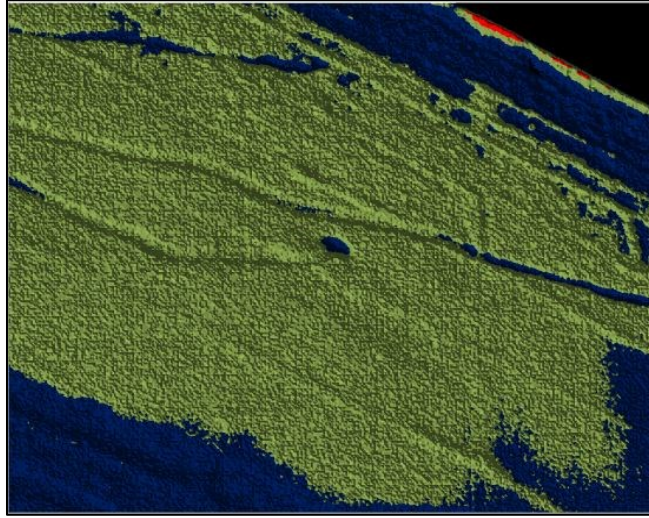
Photo at Location 14 (North Side of Wall 2)
